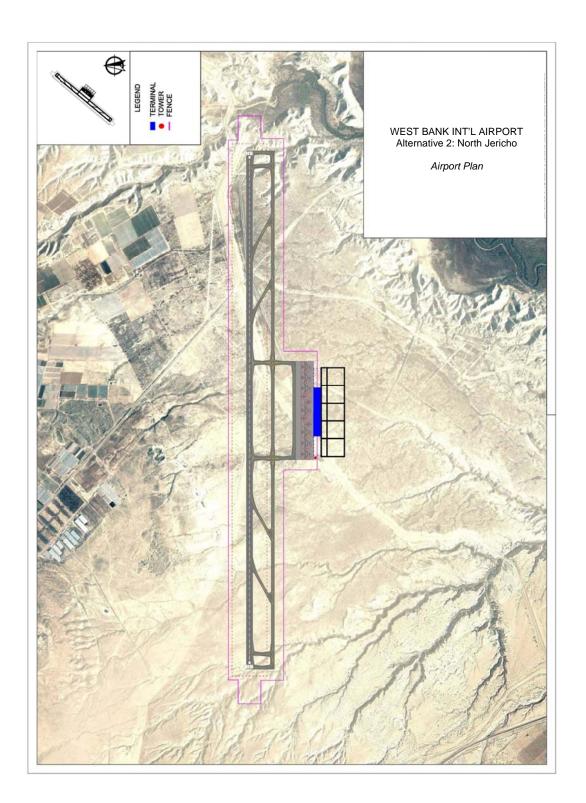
Alternative 2 – North of Jericho: Airport Plan
